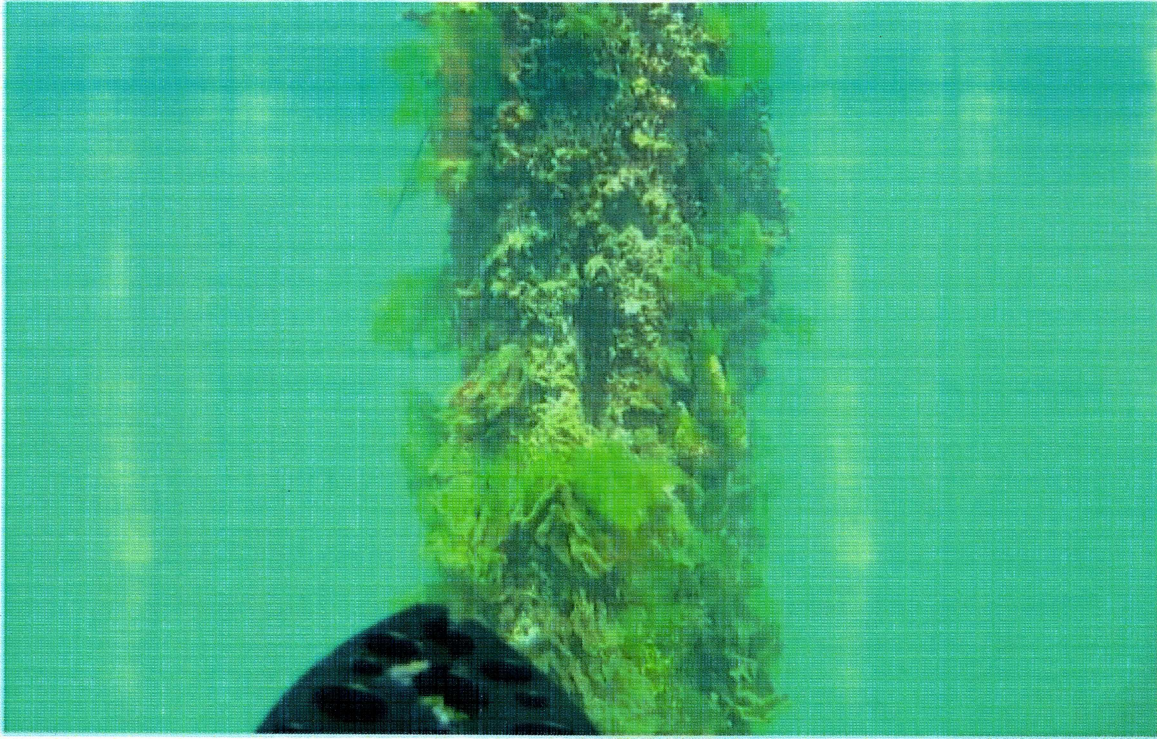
Underwater image of marine borer cavity of fender pile 14A
